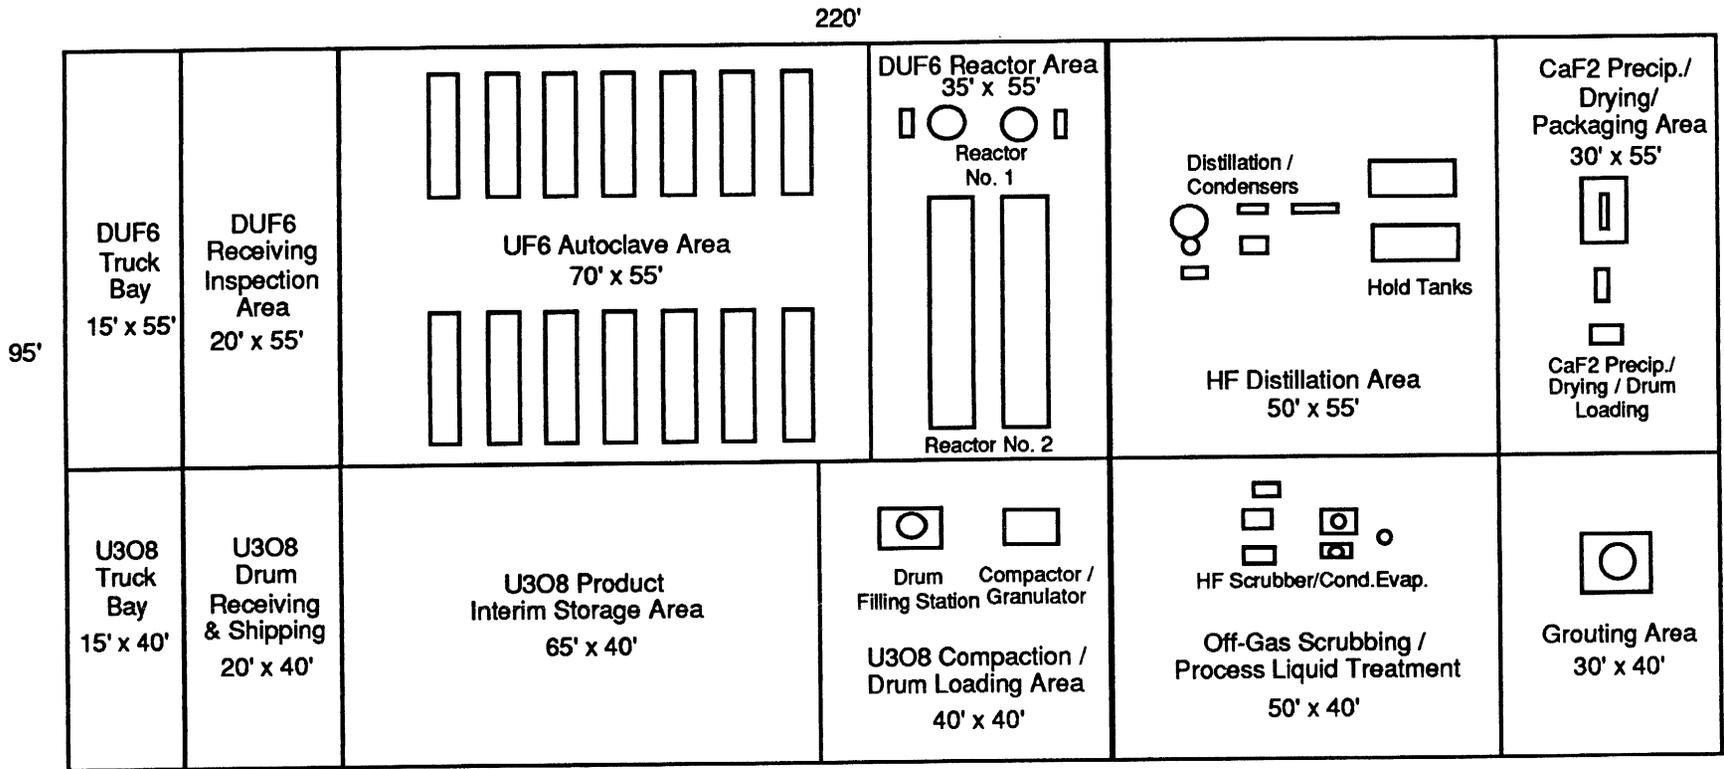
PROCESS BUILDING LAYOUT
